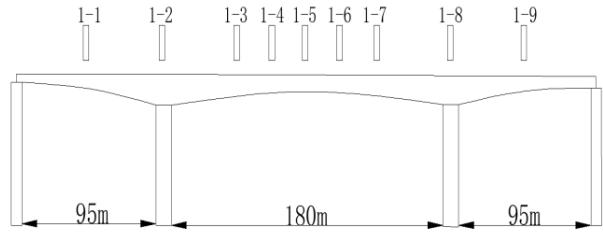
Layout of the monitoring section of the main bridge stress sensor
